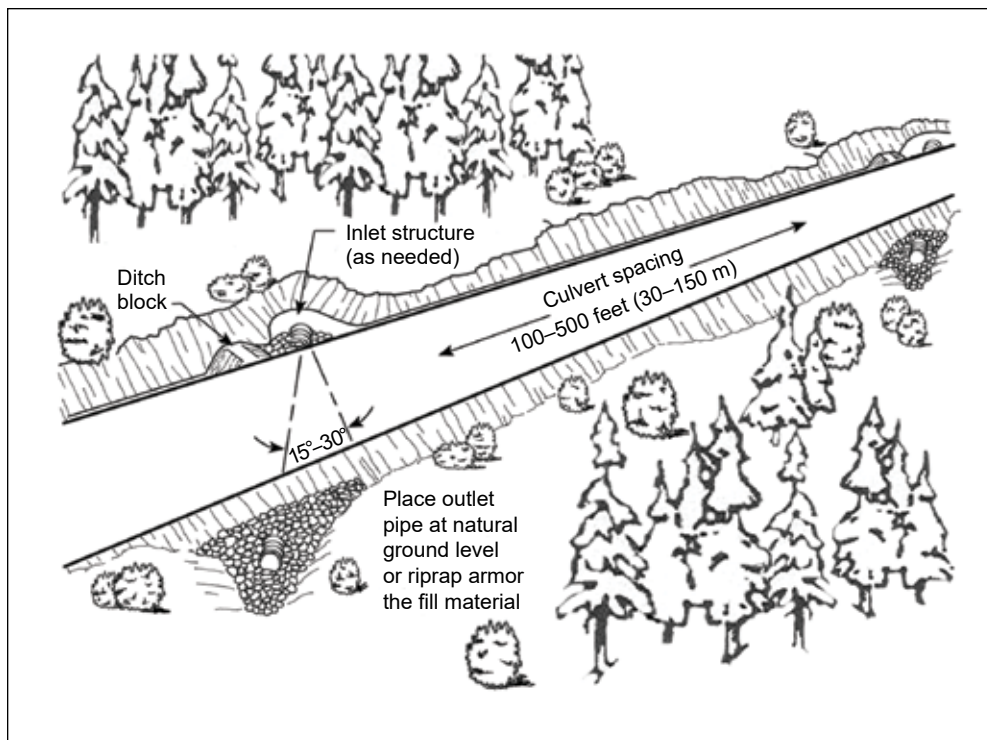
A typical culvert cross-drain installation. (Figure from Keller et al. [2011])
